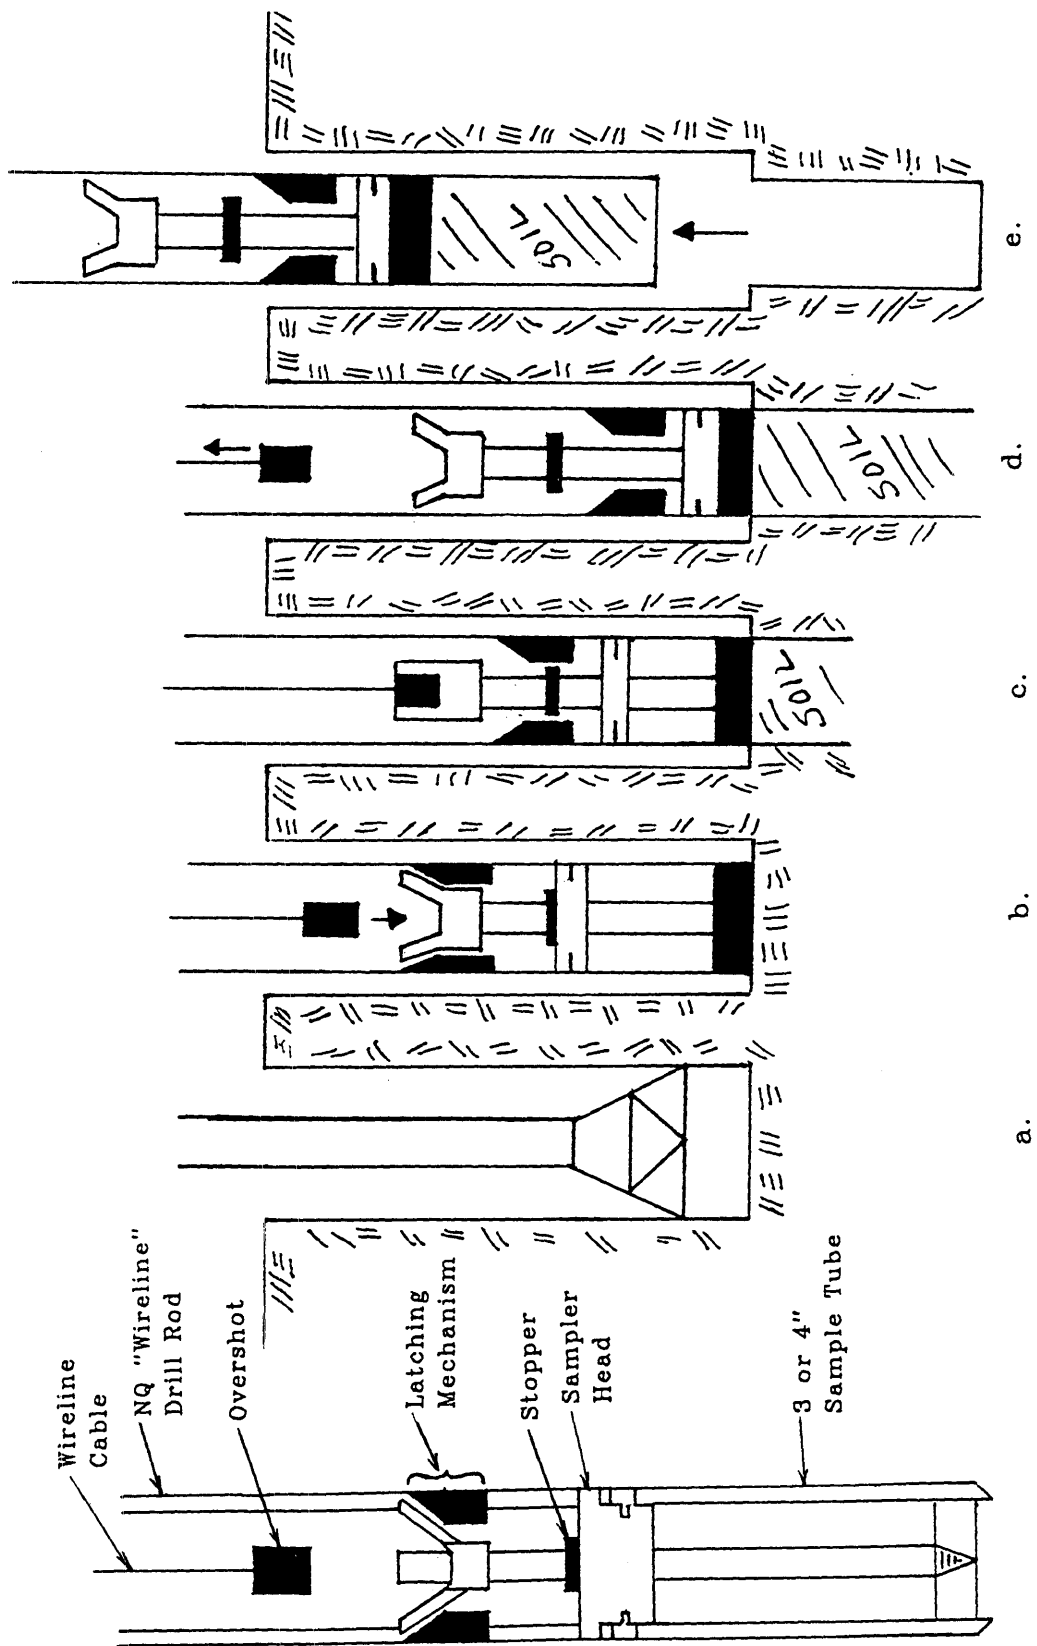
Schematic Drawing of a Modified Fixed Piston Sampler
